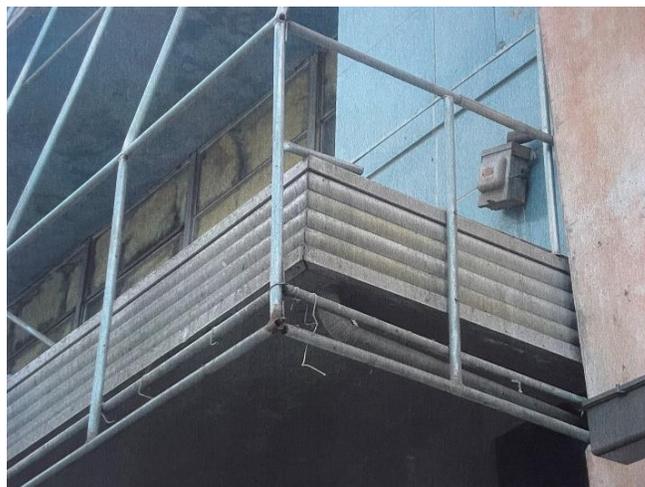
Photograph of primary façade of 2530 Bancroft taken July 2007 showing extant façade details beneath awning. Collection of BAHA.
